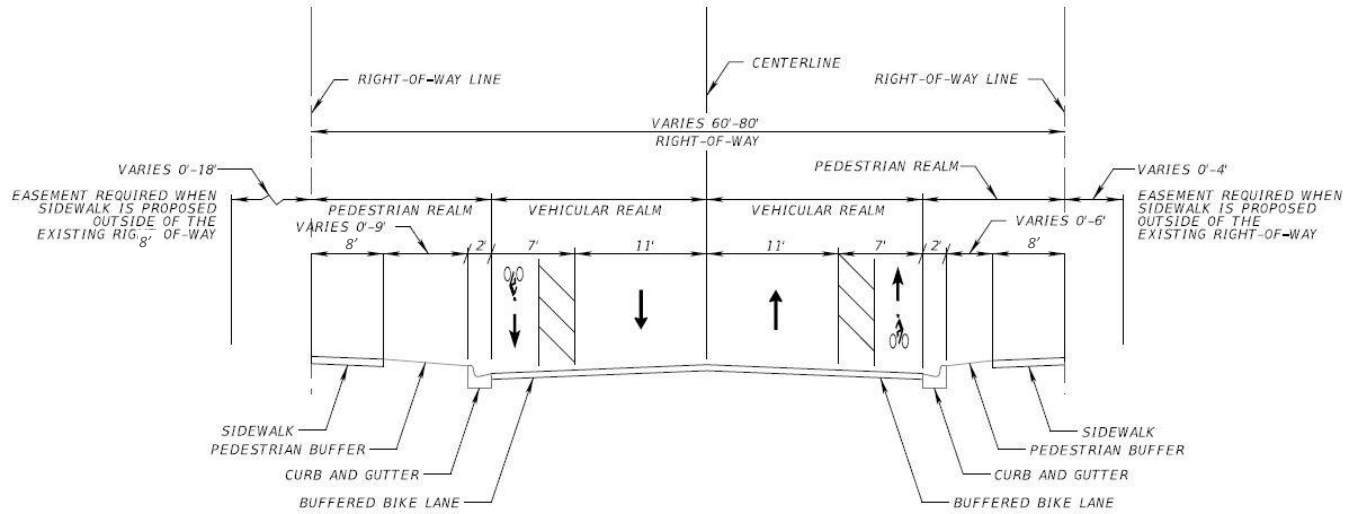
Civic Street - NW 151/NW 153 Street Proposed Concept (A-1)
